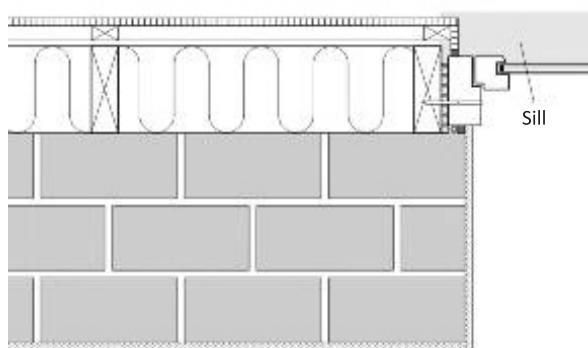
Horizontal section of the joint between the loadbearing exterior wall and the window after improved thermal insulation measures. The window has been replaced.
